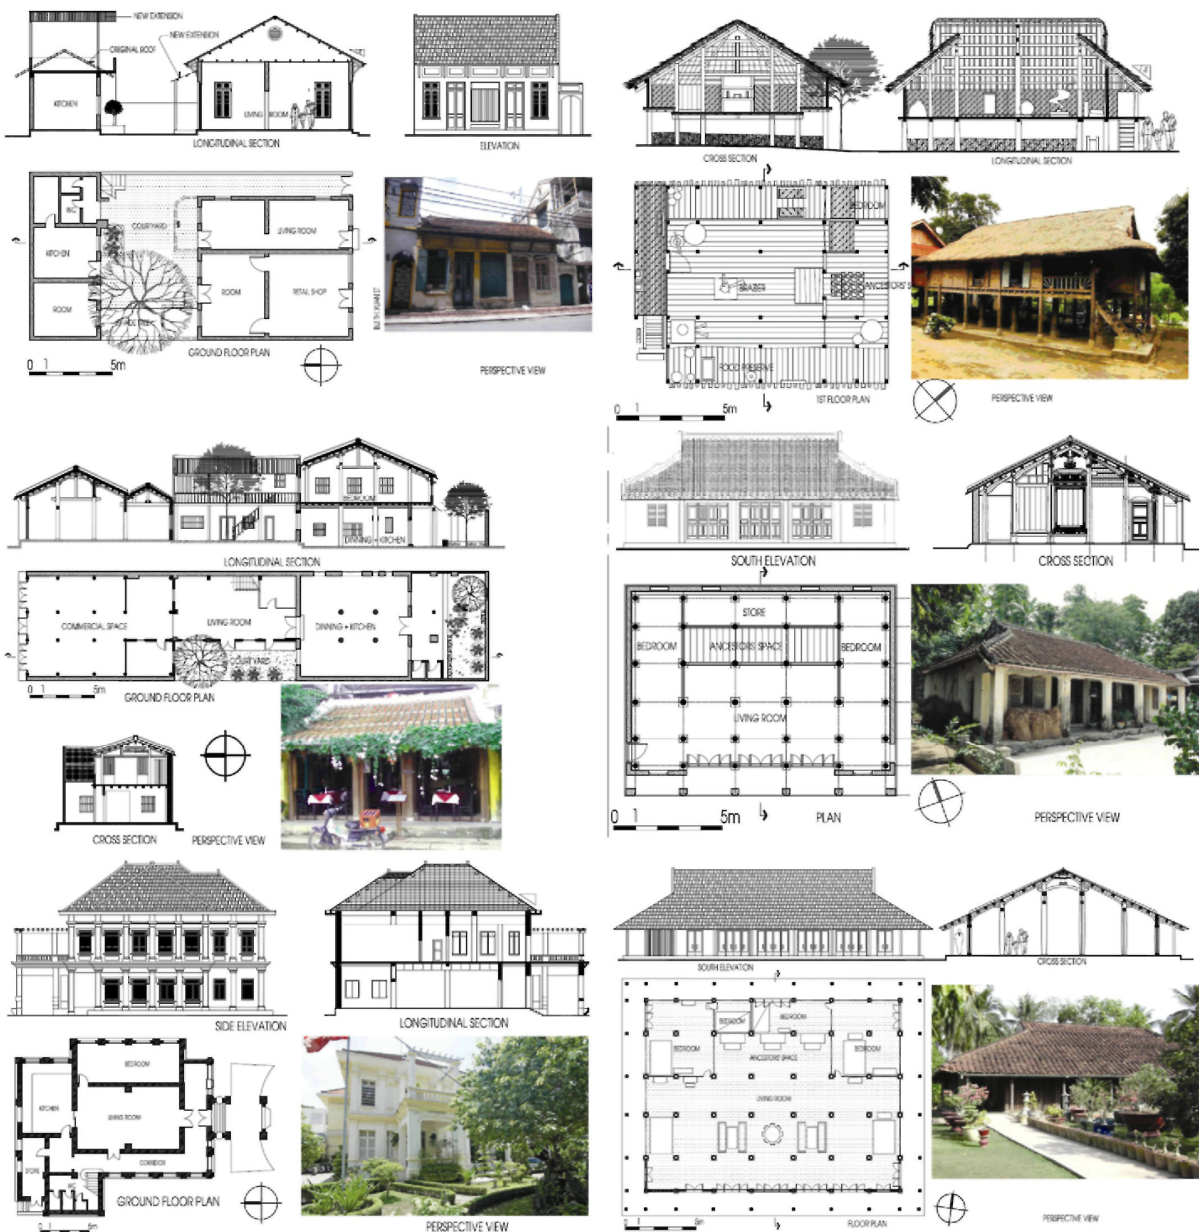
Architectural details of selected houses: house A; house B; house C; House D; house E; house F (from left to right and upper to lower, respectively).
